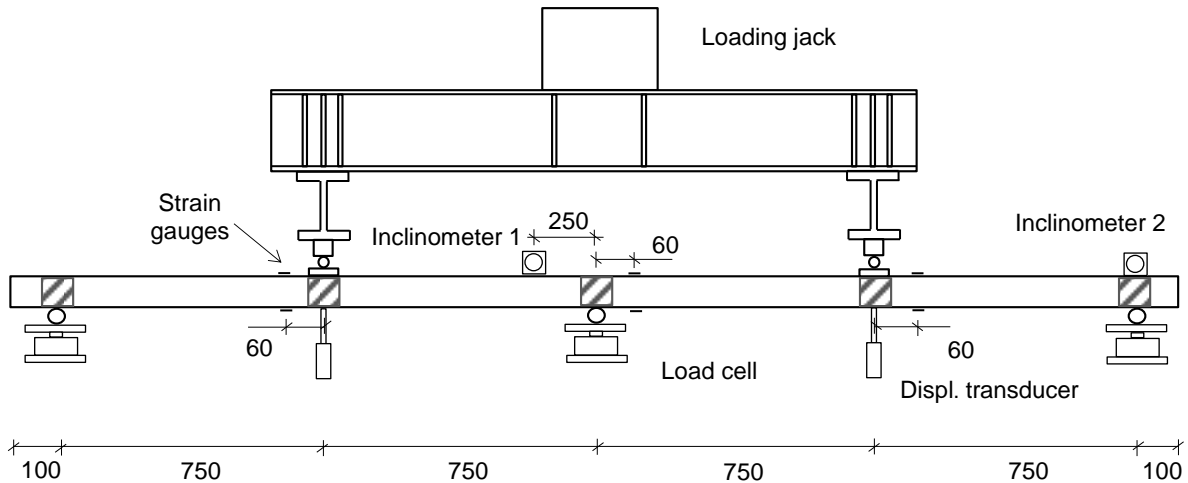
Schematic diagram of the test setup for five-point bending tests. Dimensions in mm.
